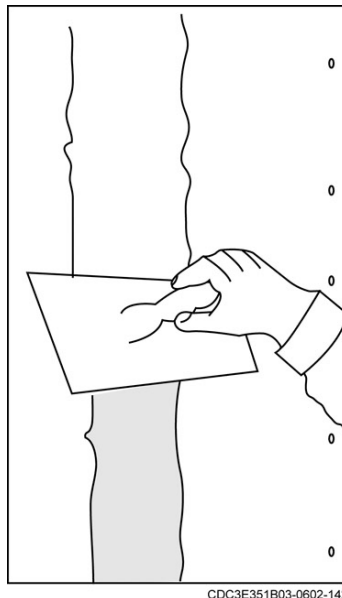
Using a trowel to smooth the compound finishing gypsum board.
